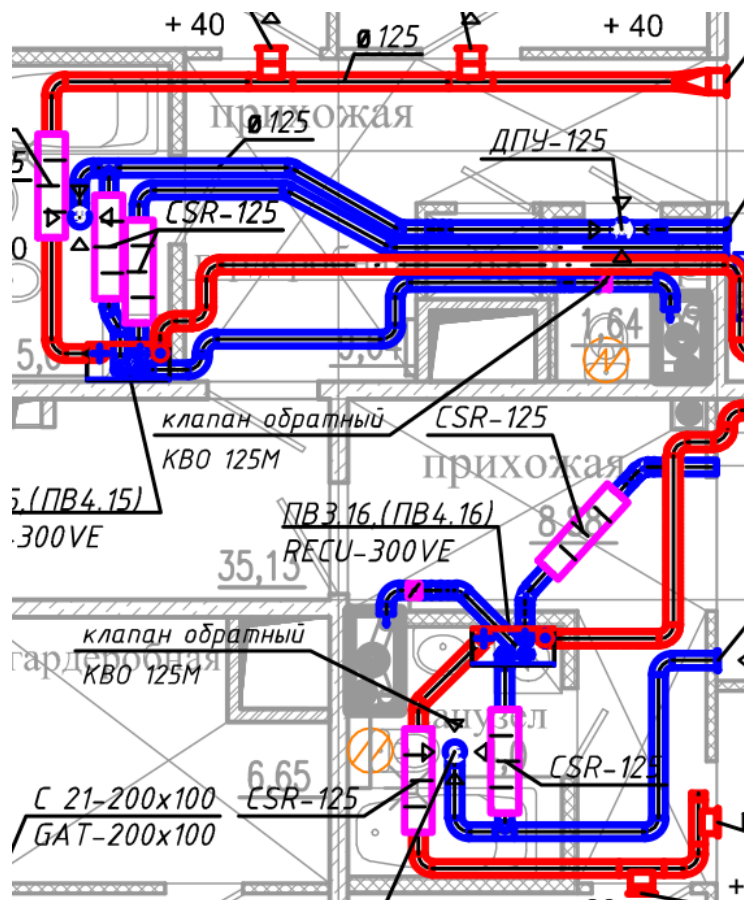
Part of flat plan on ventilation drawings. Swedish krona. Building 15
